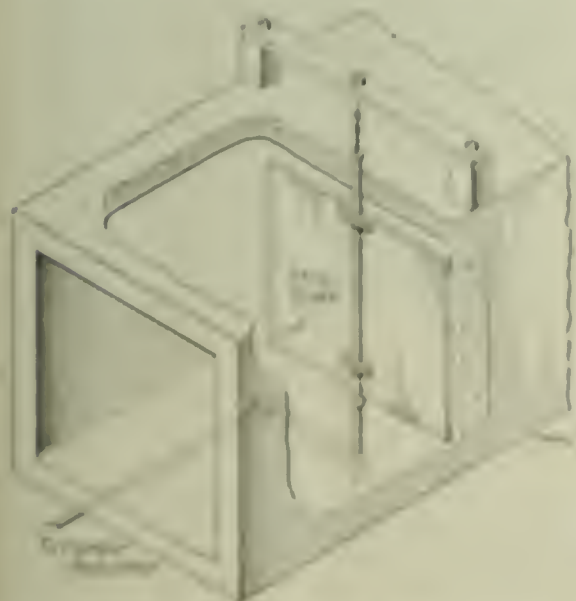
DETAIL OF DAMPER ARRANGEMENT.
